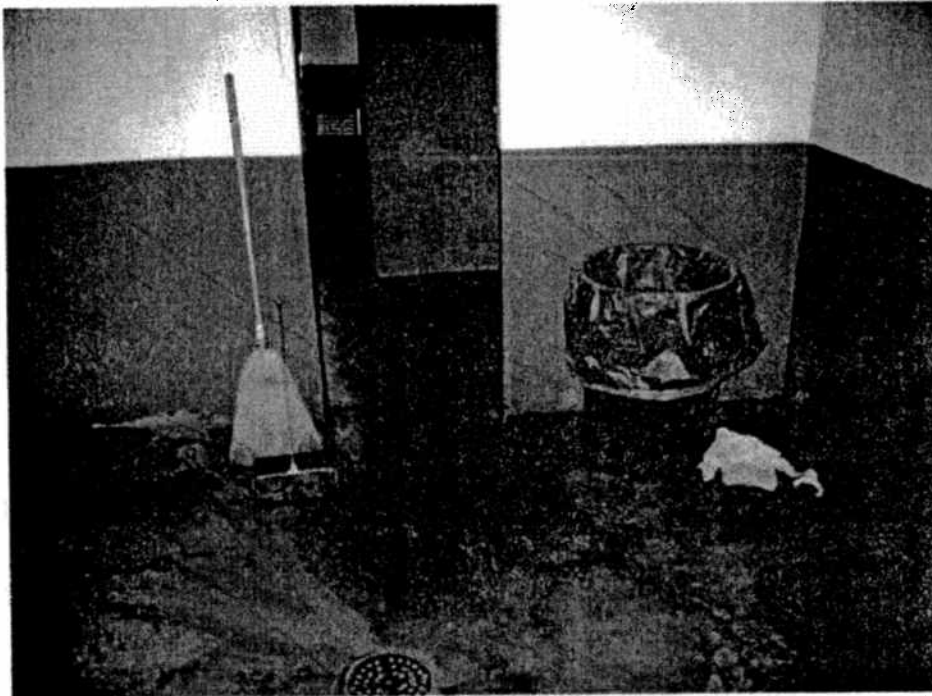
Toilet and shower facilities located south off the hallway seen in photo 27.
